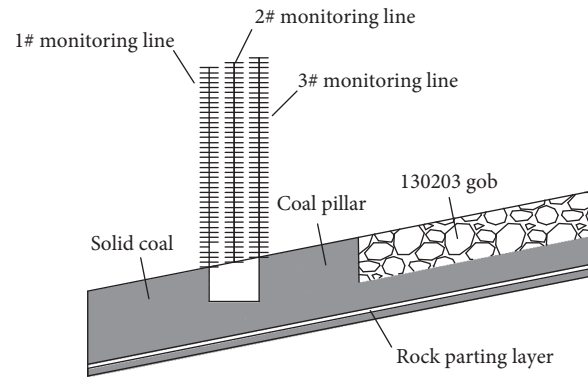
Monitoring point arrangement plan in the roof of the roadway.
